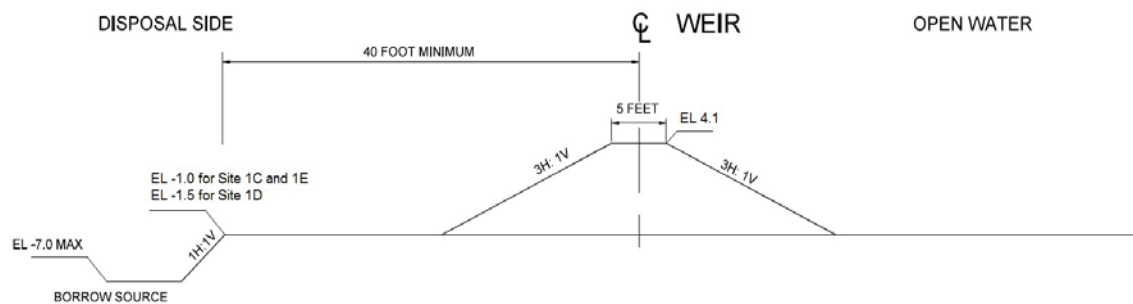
Typical Section Earthen Weir for Site 1C, 1D, and 1E
